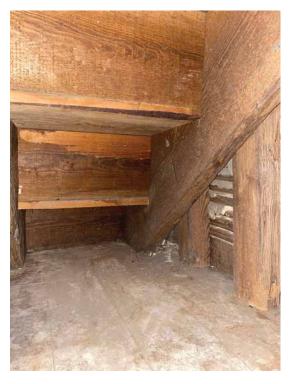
(Above) The north stair (C101). JGWA, 2024.
